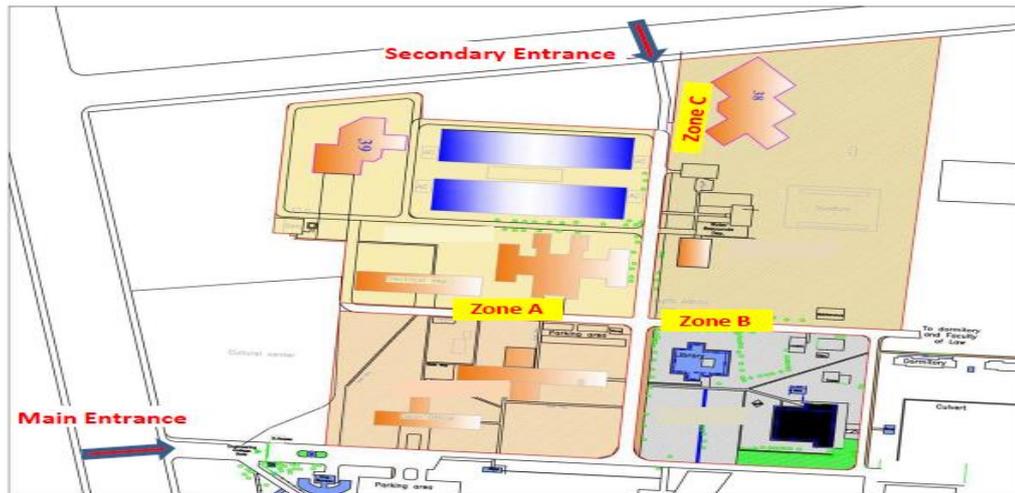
Site plan of Engineering College, Slahaddin University – Erbil (Authors).
